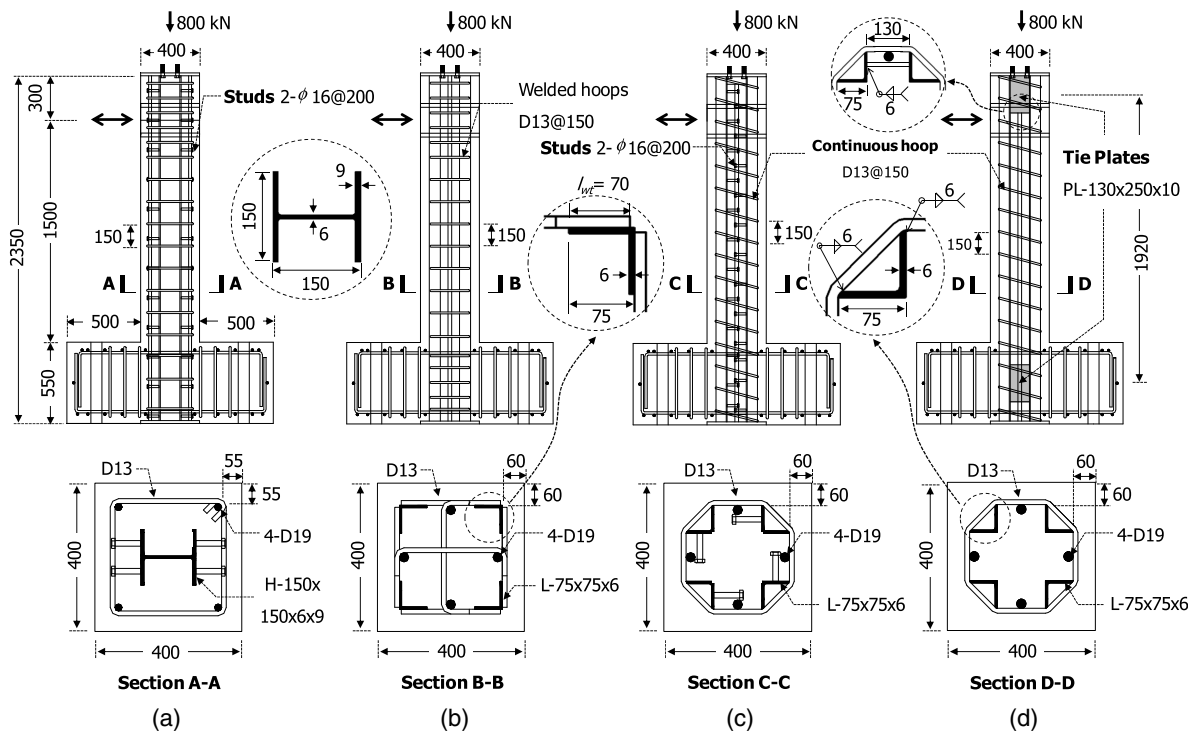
Dimensions and details of cyclic loading test specimens (mm): (a) C1; (b) C2; (c) C3; (d) C4
